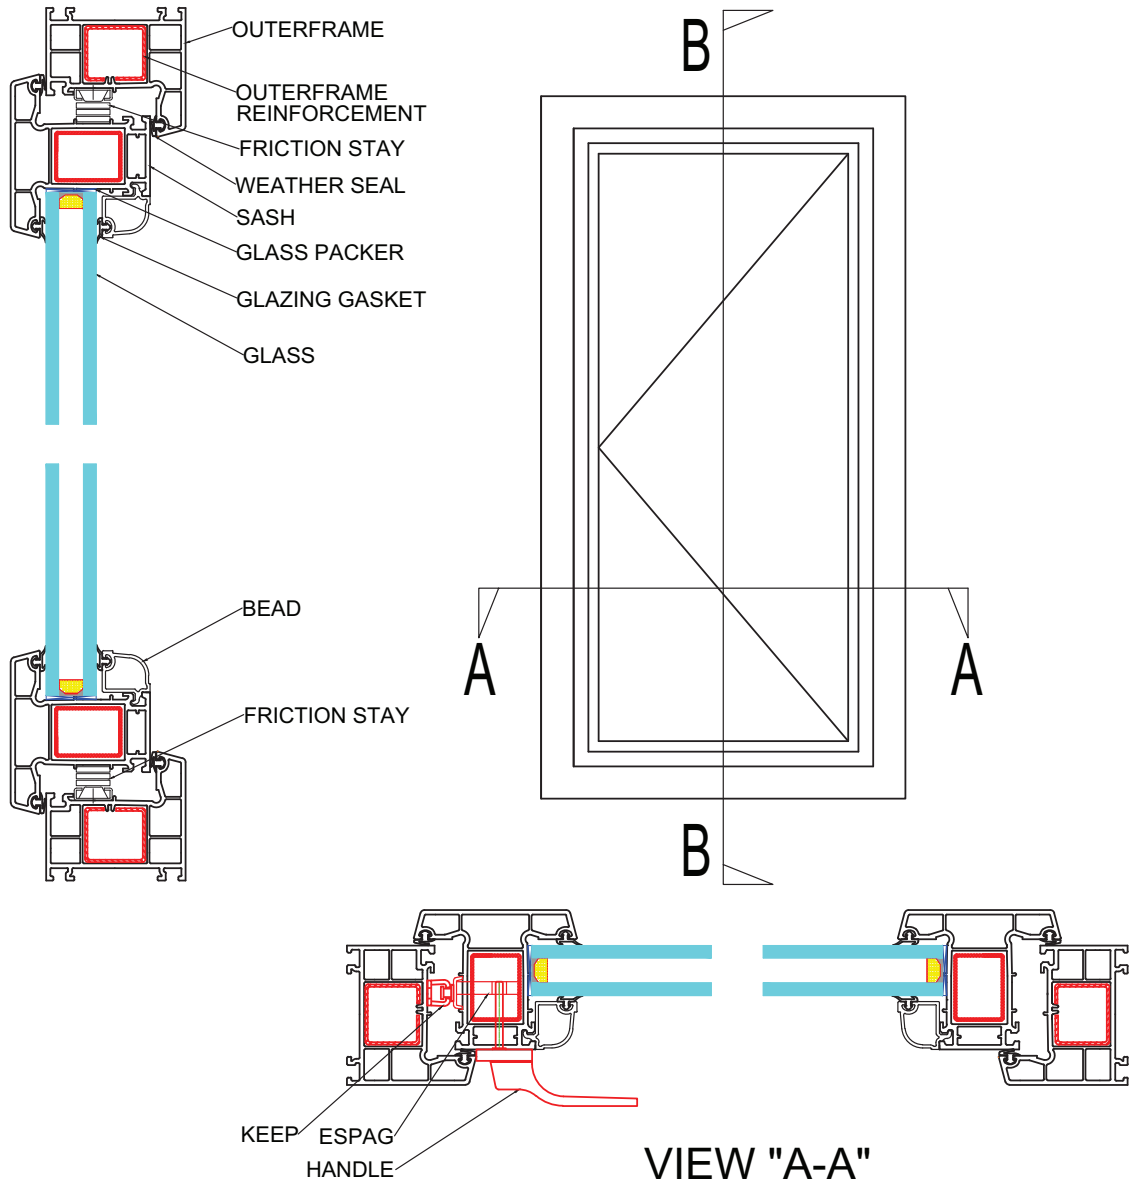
uPVC Doors and Windows (Typical casement system)
